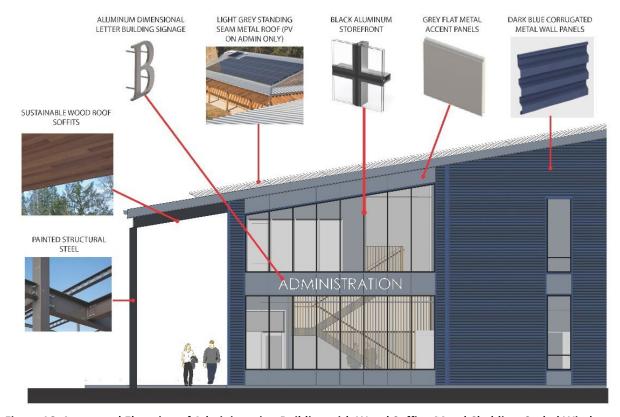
Annotated Elevation of Administration Building with Wood Soffits, Metal Cladding, Scaled Windows
